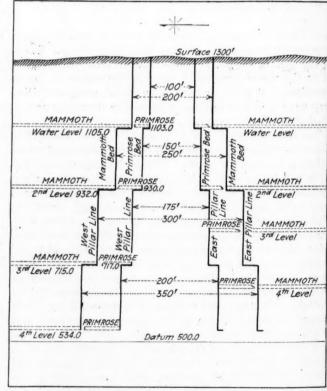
LONGITUDINAL SECTION OF A BARRIER PILLAR OF VARYING WIDTH
